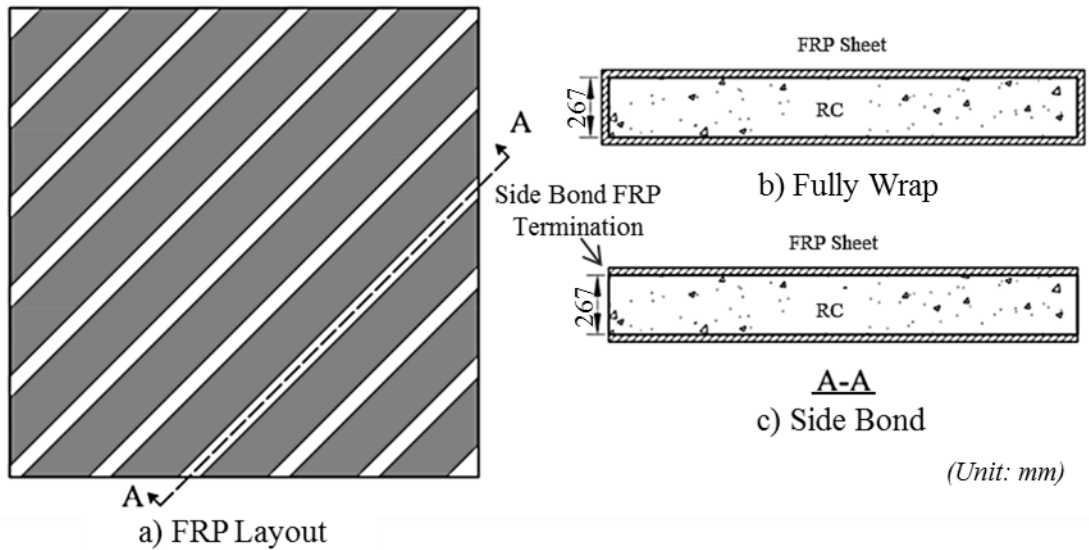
Layout and wrapping method of FRP sheets, a) FRP layout, b) Fully wrap, and c) Side bond wrapping scheme cross sections
